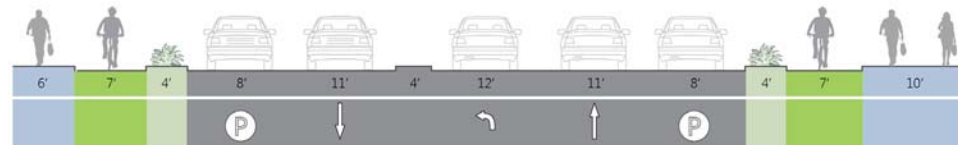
Proposed Protected Bike Lane on University Avenue East of College Avenue
